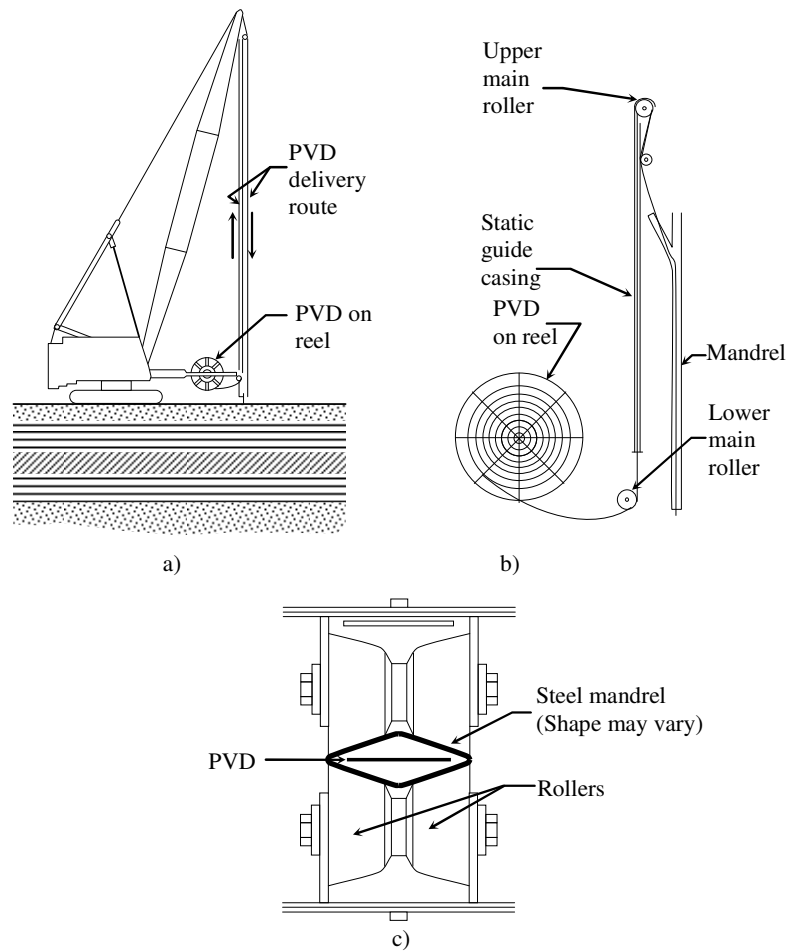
PVD installation a) crane mounted installation rig, b) drain delivery arrangement, c) cross section of mandrel and drain (after Koerner, 1987)
